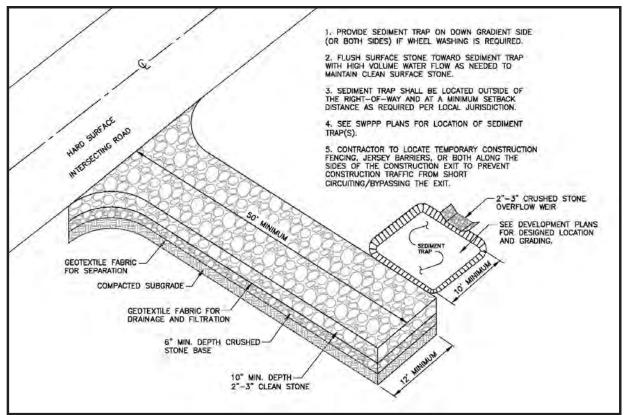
Typical Temporary Rock Construction Exit. Source; BFA Inc.
